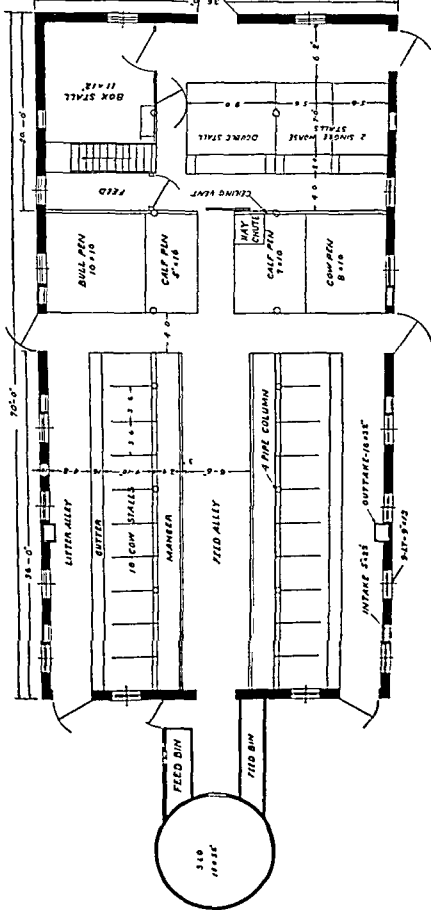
Floor plan to house 32 milk cows together with calving pen and pens for young stock
